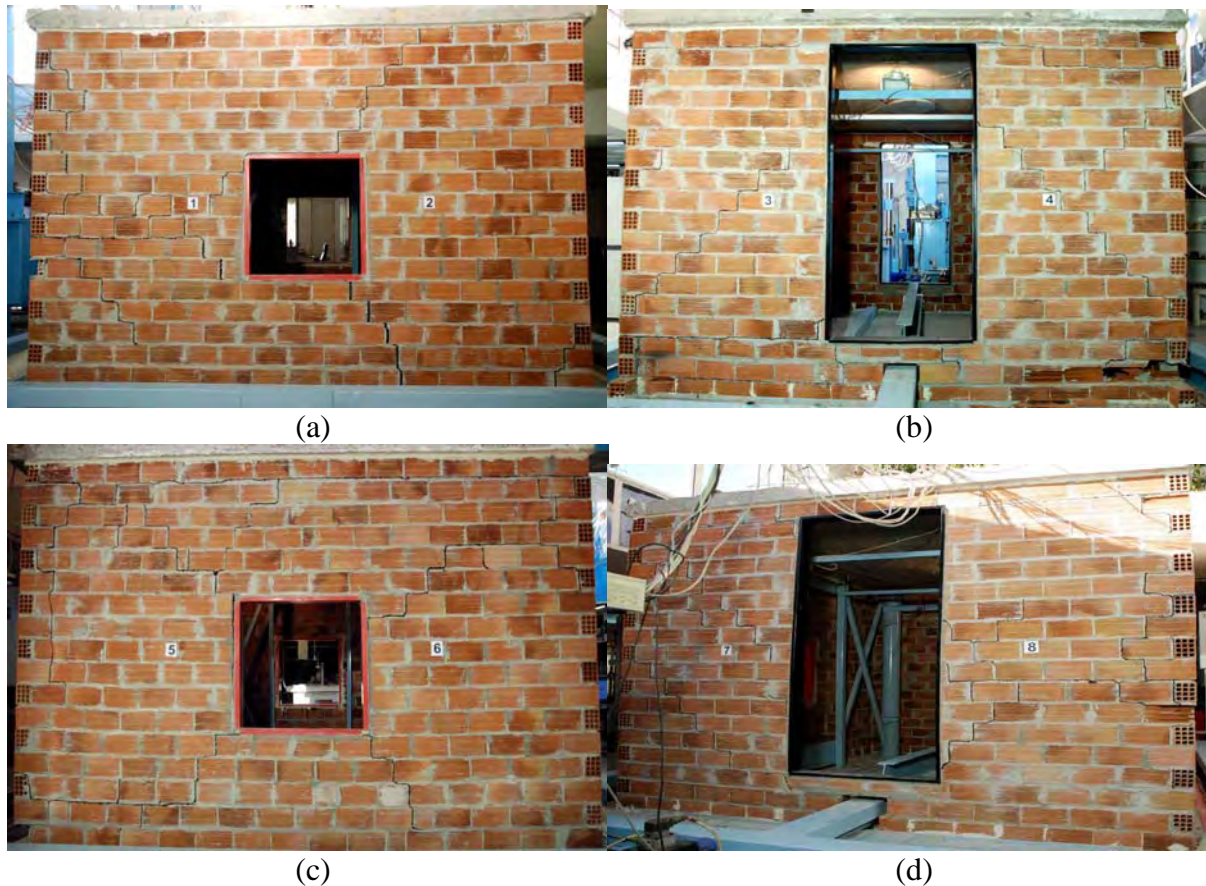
The masonry building damaged after the application of the sixth seismic event. (a) Walls 1 and 2, (b) Walls 3 and 4, (c) Walls 5 and 6, (d) Walls 7 and 8.
